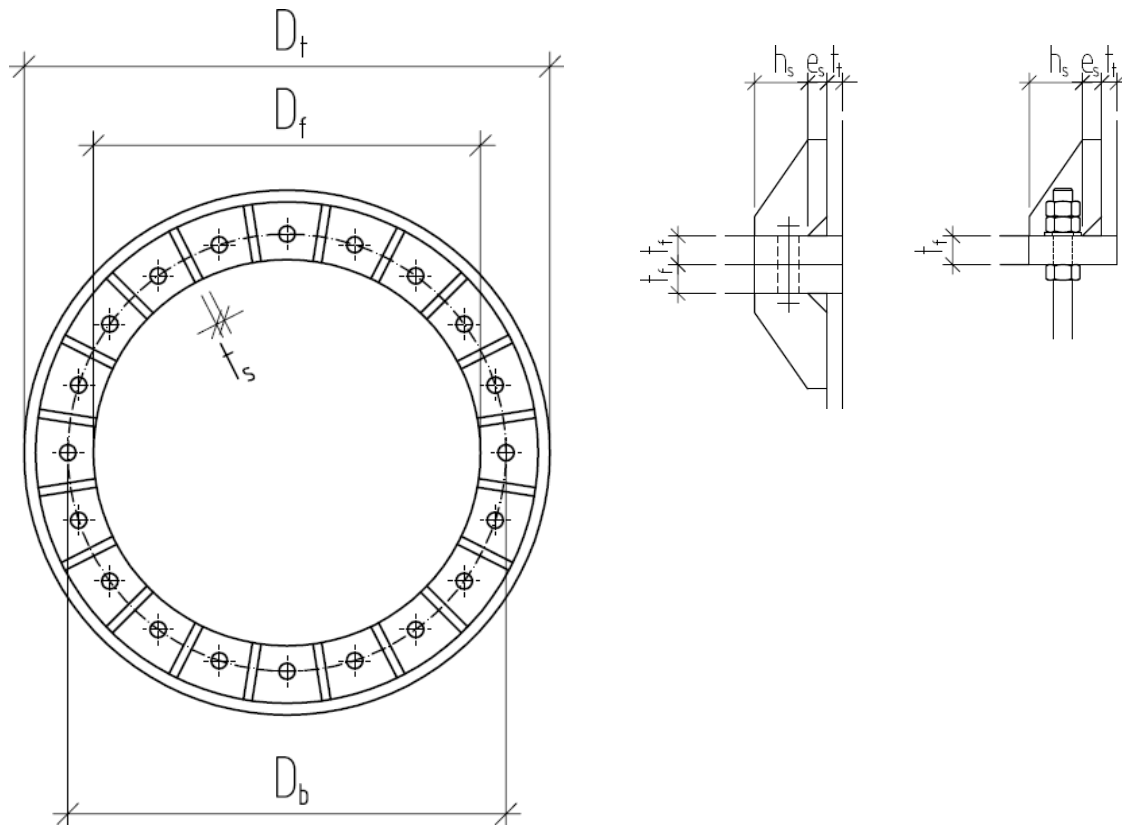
Connection of monopole – bolts inside the tube - plan (left), detail of connection of two panels (middle), detail of base flange (right)
